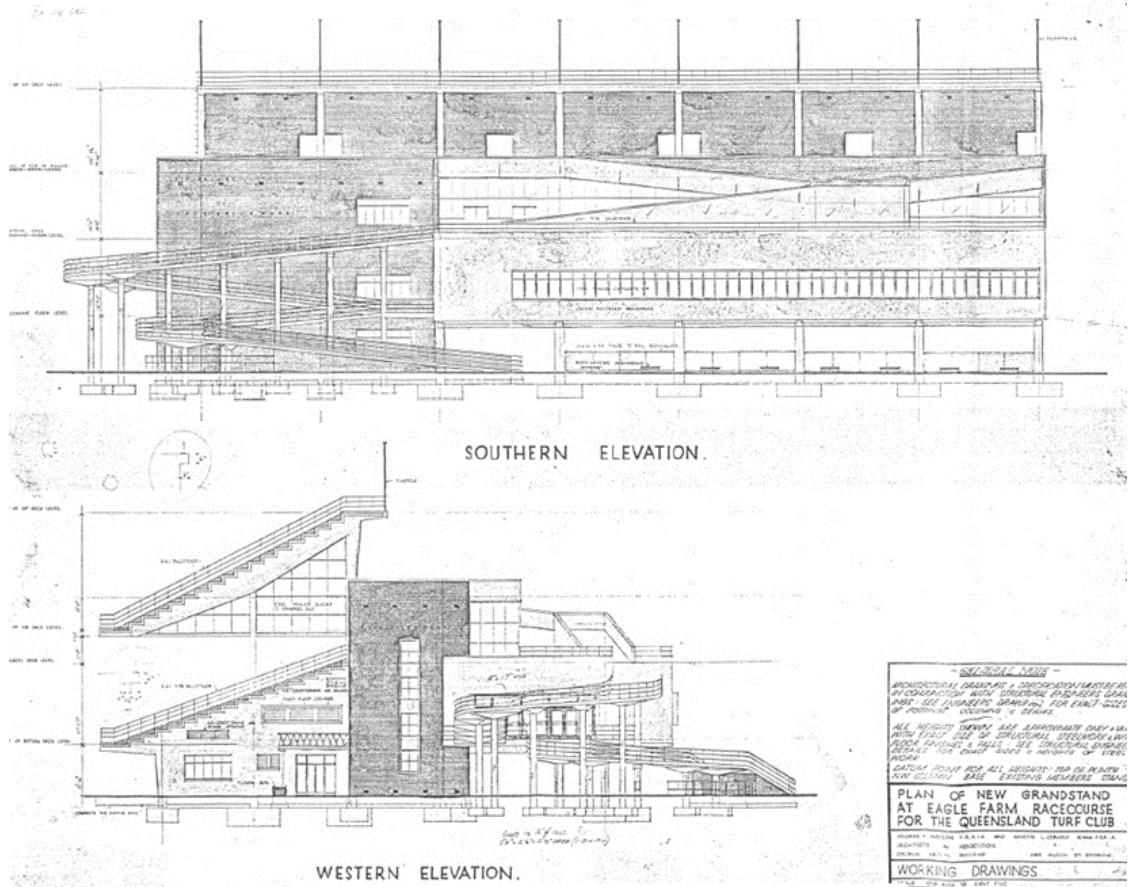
Southern and western elevations of the John Power Stand in the 1954 plans
